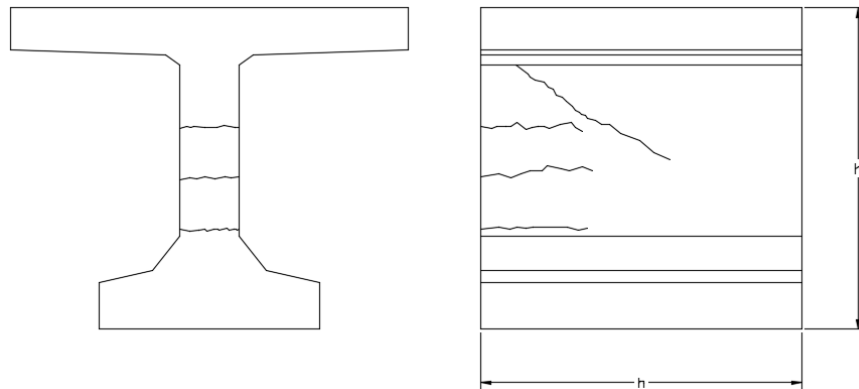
Typical Anchorage Zone Crack Pattern for PCBT
